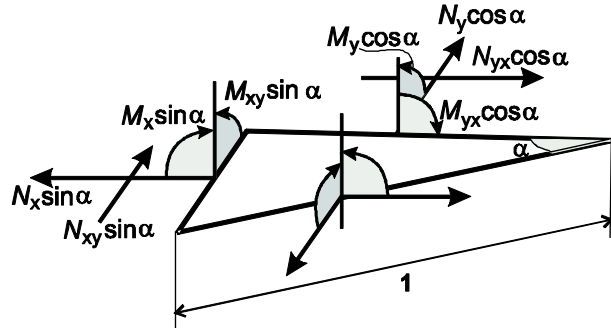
To the determination of stresses in reinforcement and concrete in the area of an oblique crack:
